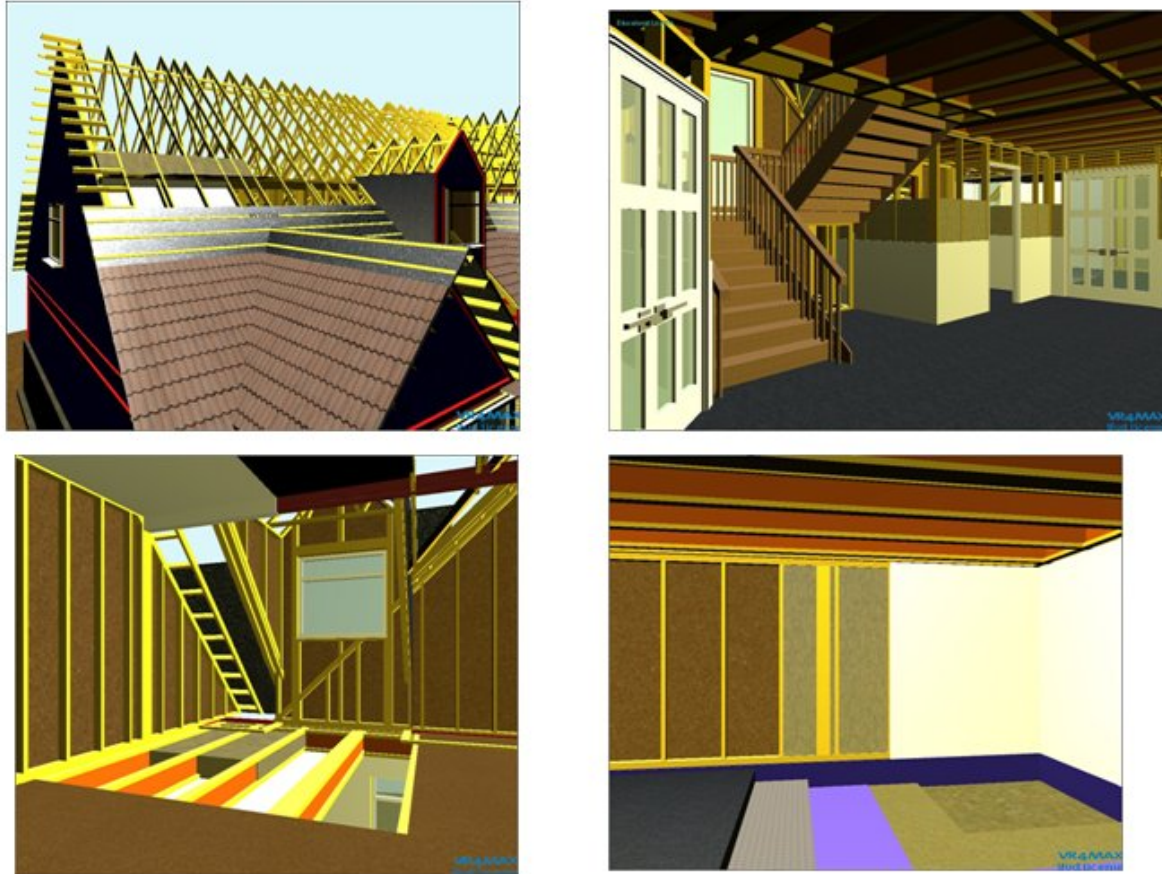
Fully interactive VR model of timber frame house showing construction details. (Student: Peter Jones)
